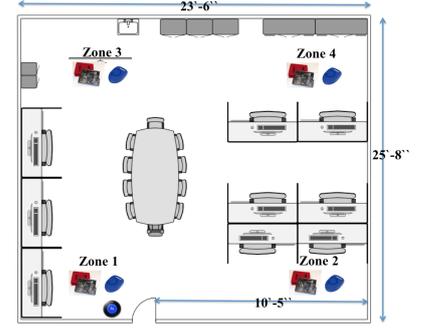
Laboratory space layout (6th floor - RPI JEC building) with sensors and thermostat location.
